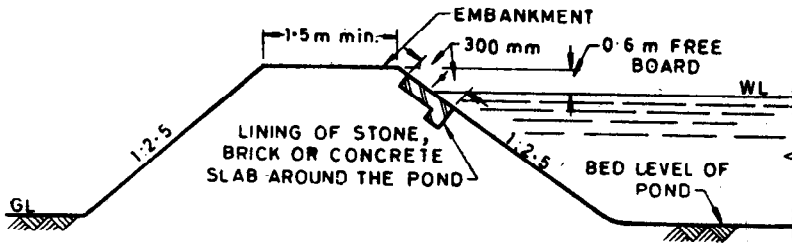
TYPICAL DETAILS OF LINING ON THE EMBANKMENT SURFACE
